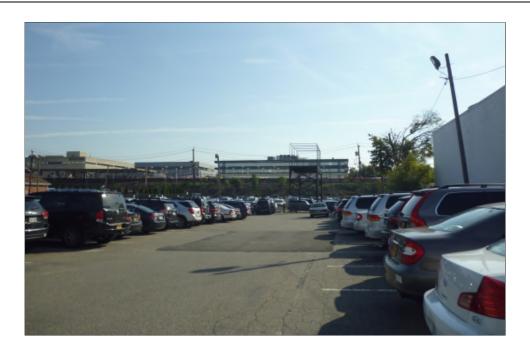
Looking south from West John Street across surface parking lot for Hicksville Station north of West Barkley Street, east of Marion Place, proposed parking structure location. Elevated LIRR structure and Hicksville Station are in background. Hertz building at right of photo, not within parking lot parcel.
